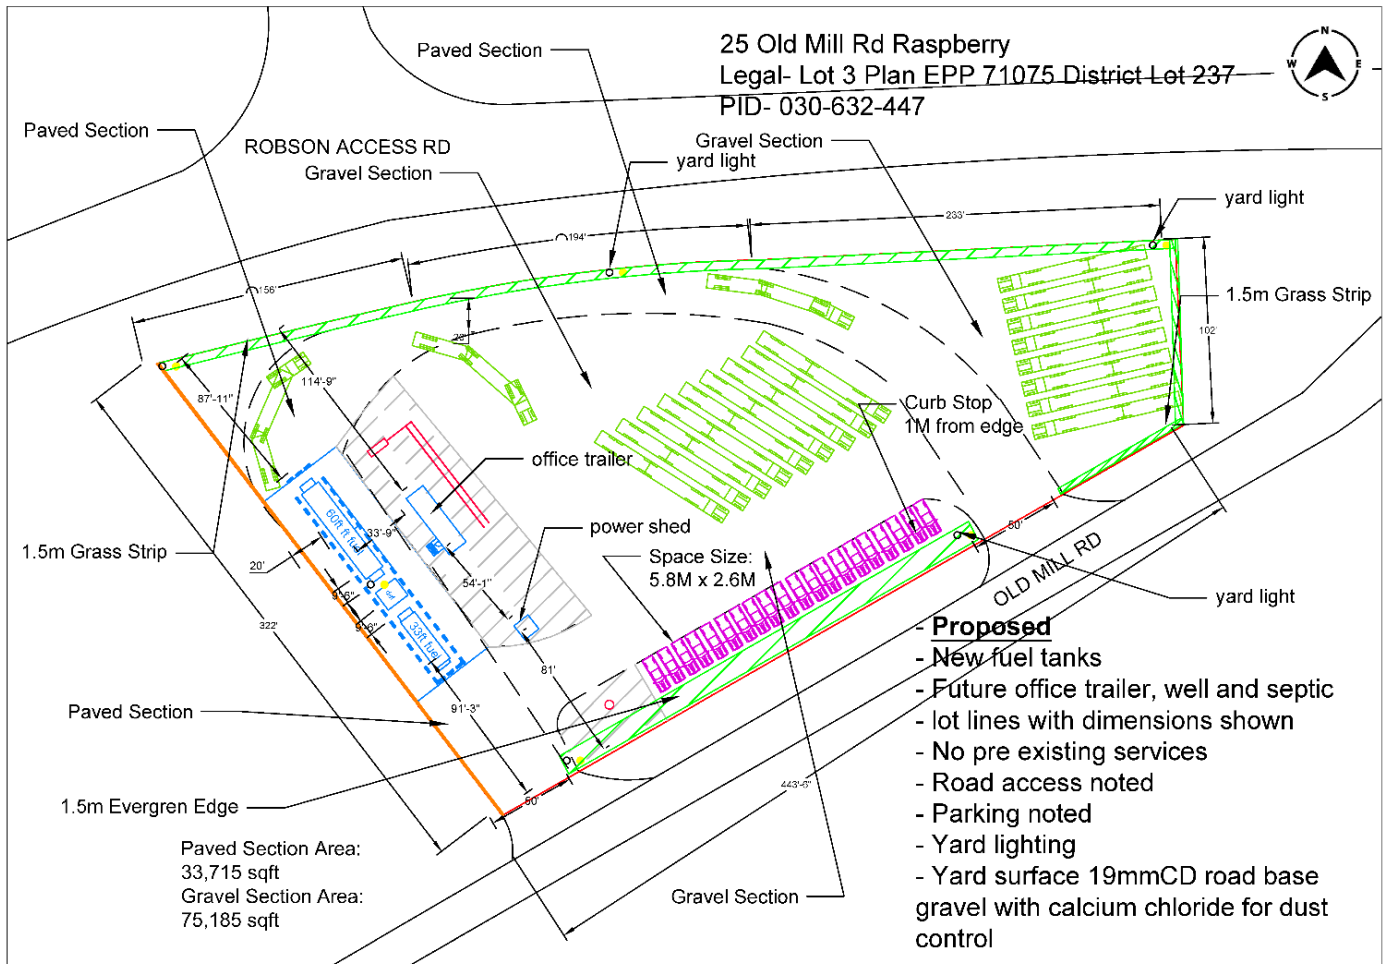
Site Plan Drawing showing the proposed paved and unpaved portions of the subject property.
